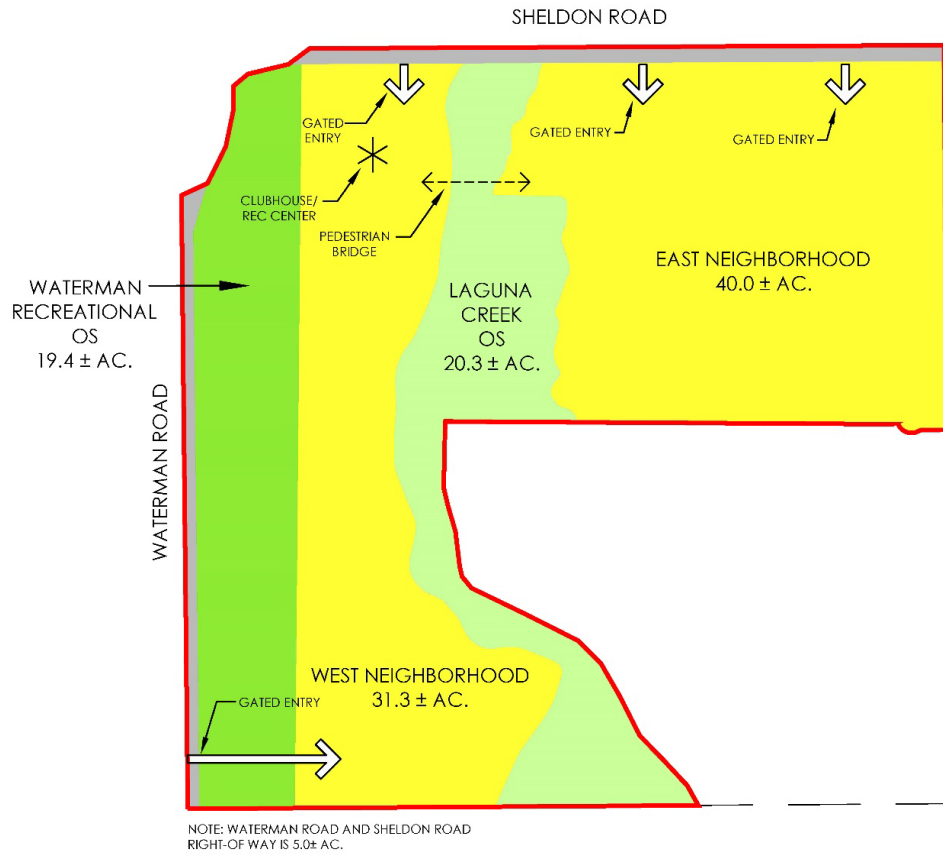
Conceptual Site plan Clubhouse and Recreation Area
